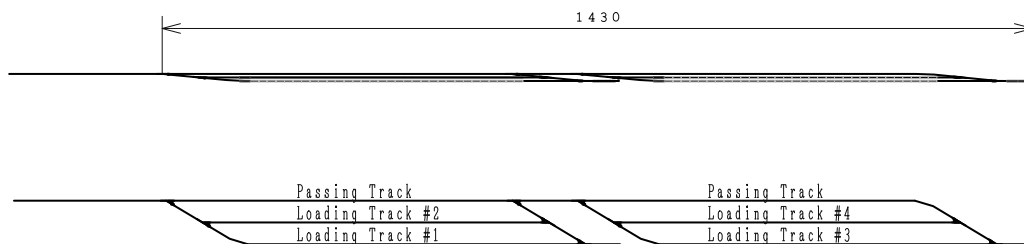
Track Layout of Cimalaya Container Terminal
